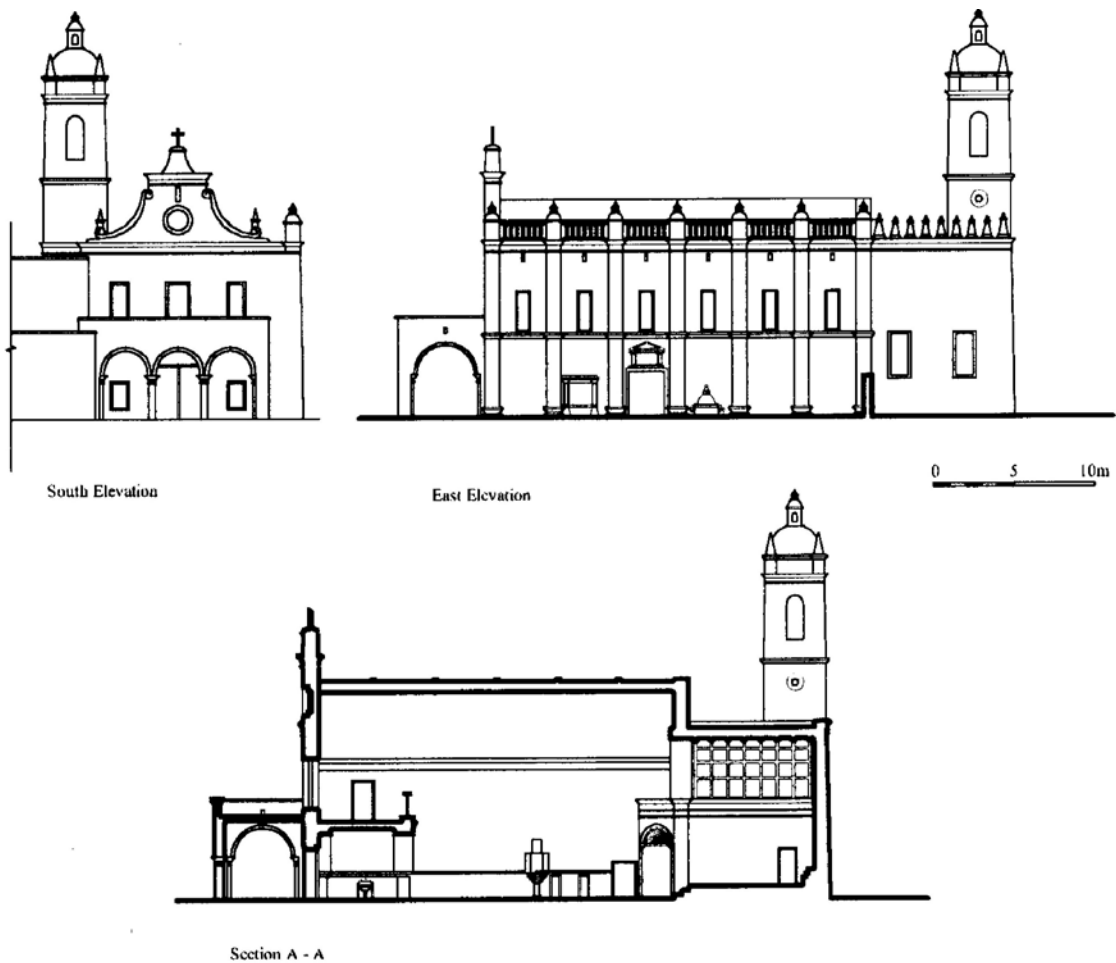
St Francis's church, south and east elevation, and longitudinal section A-A through the church.
